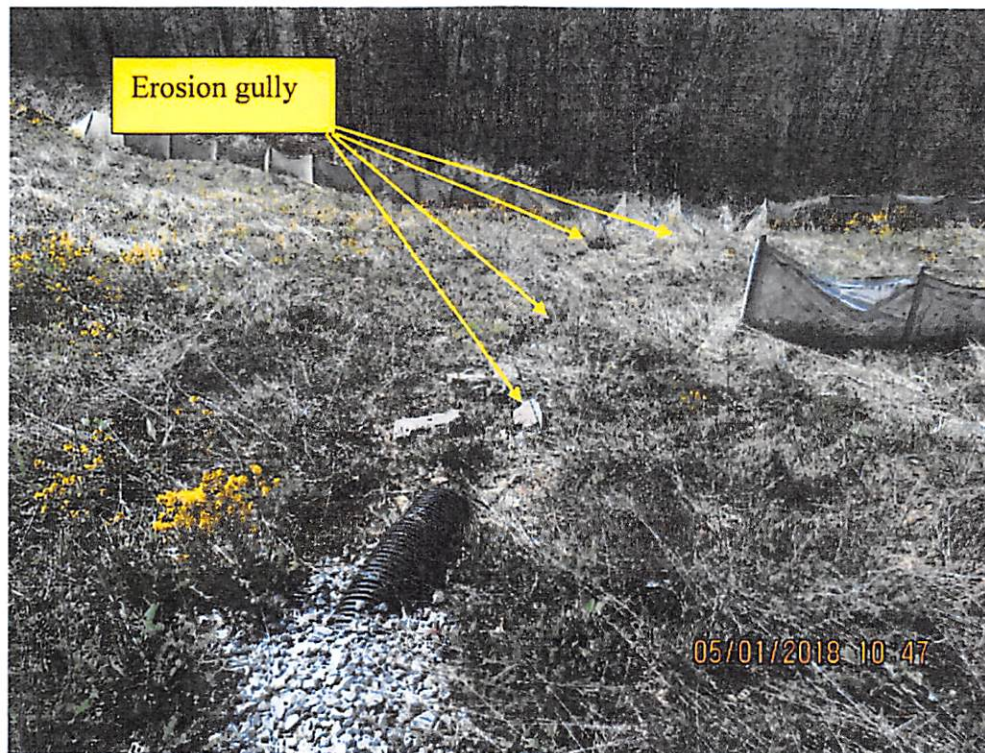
Unprotected outlet of amphitheater drainage creating erosion gully along slope.
